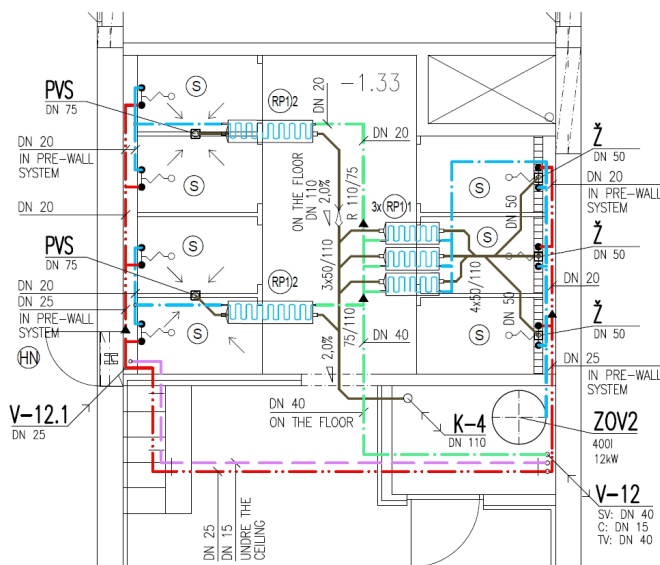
Floor plan with alternative solution of recovery of waste heat using direct parallel connection of panels
